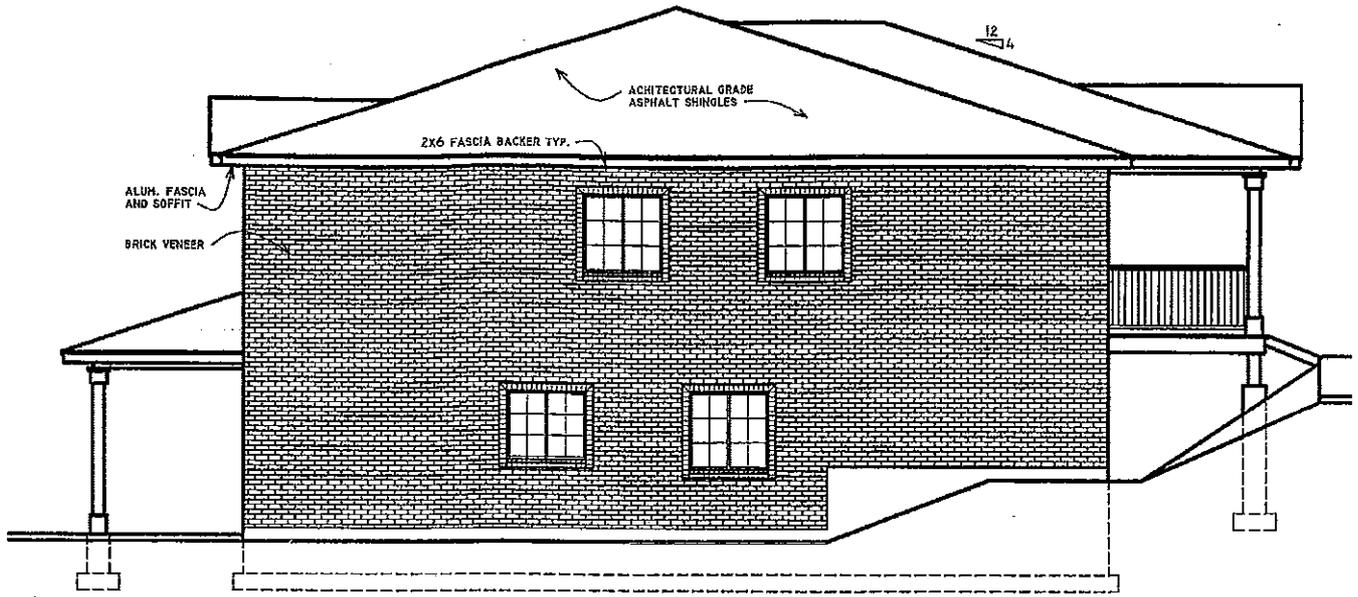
EXHIBIT "B" – PROPOSED BUILDING ELEVATIONS
